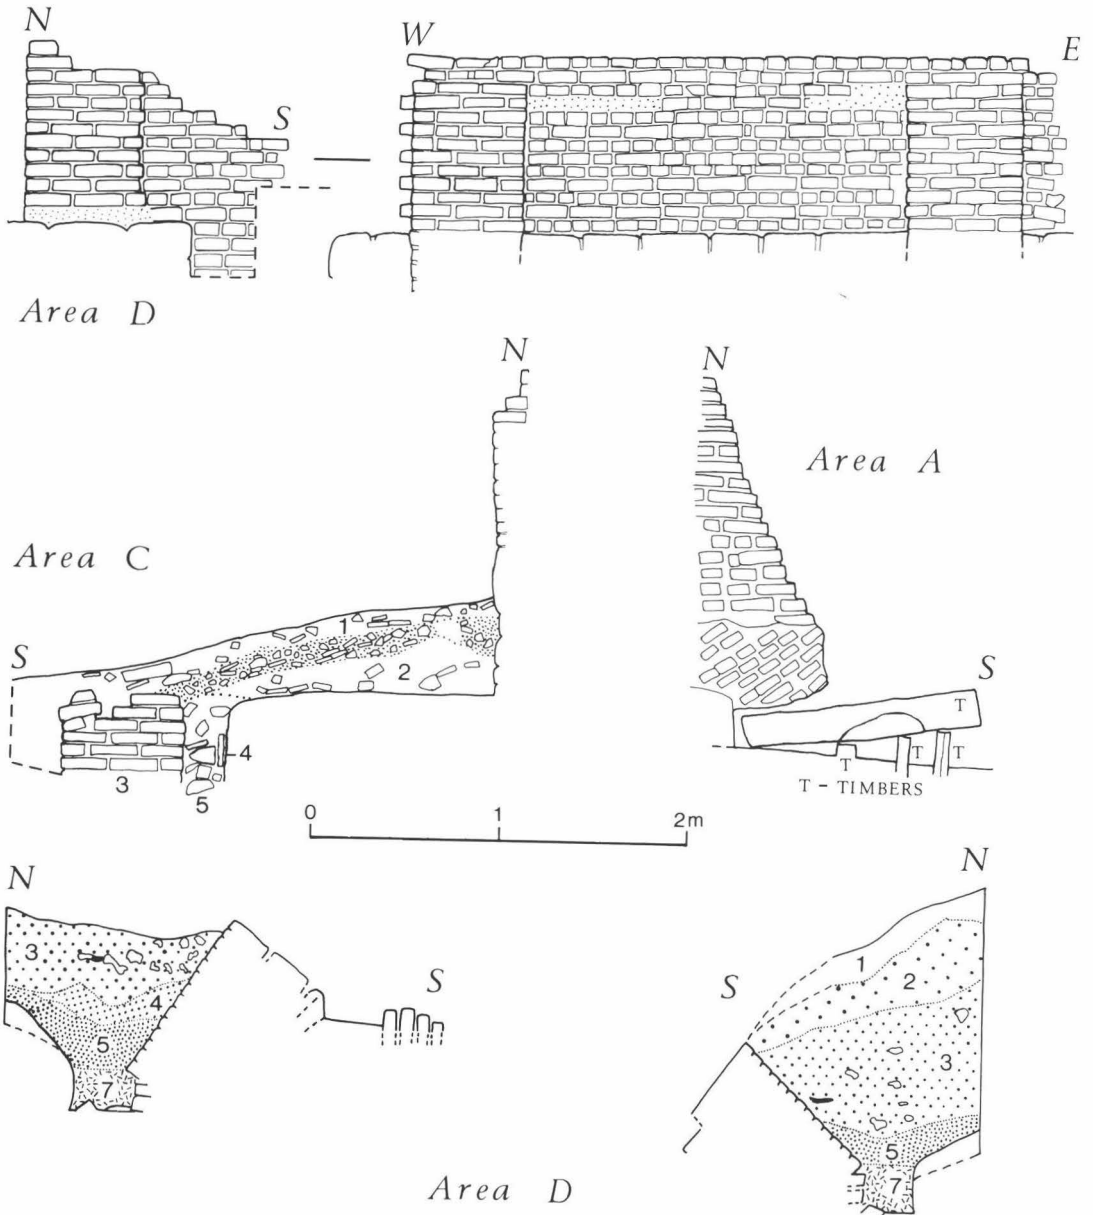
Laughton Place, 1984. Elevations/sections of Tudor brickwork. Areas C and D.
